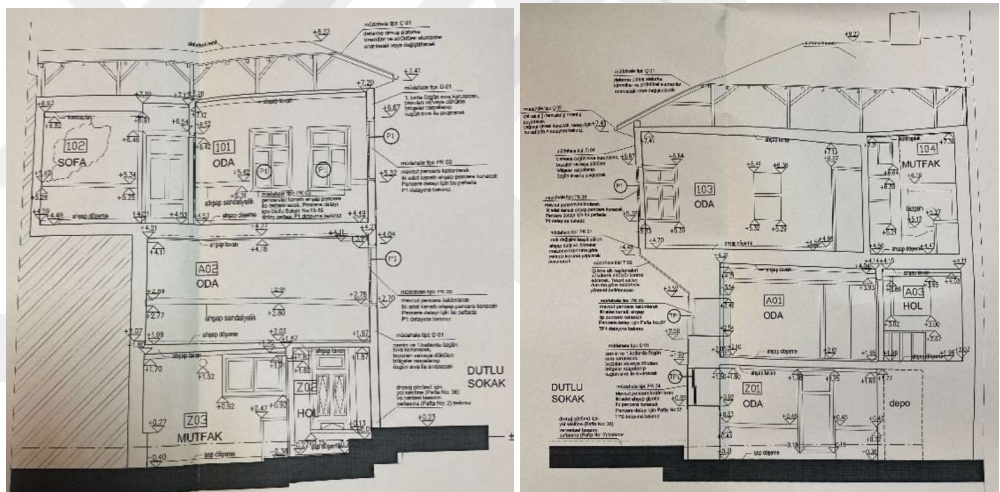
Registered buildings – Section A-A / B-B: 1/50
